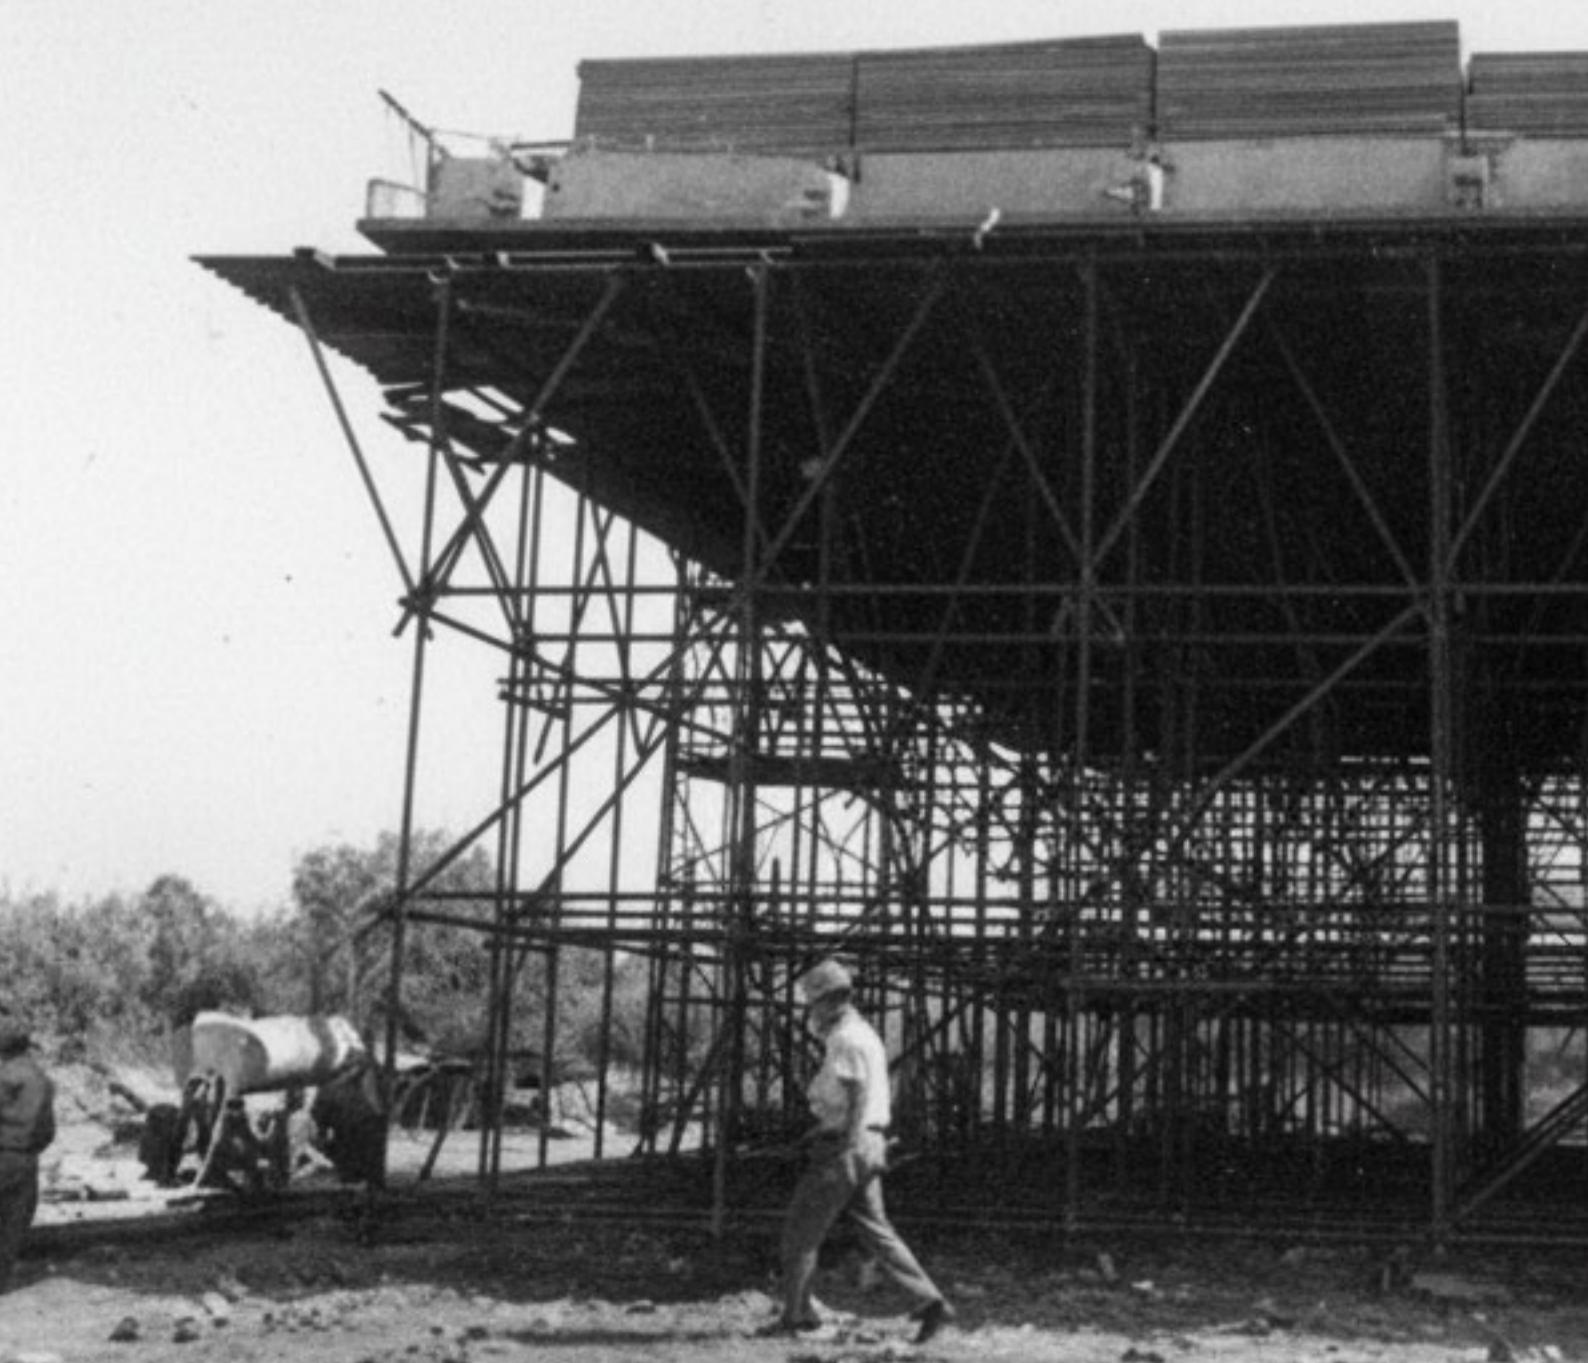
Construction of the Grand Cover with shoring for support of formwork and concrete for roof structure (July 9, 1965).
